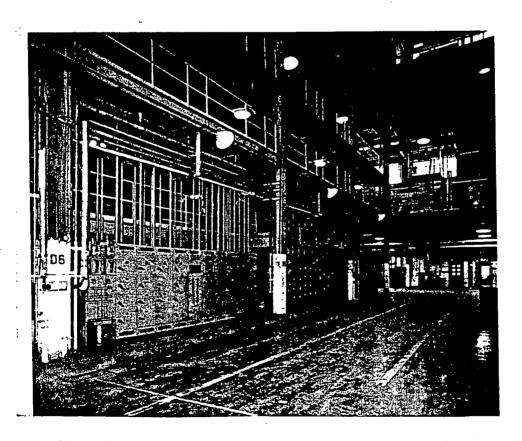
East Electrical Panels on First Floor (ELEV. 580' - 0")
